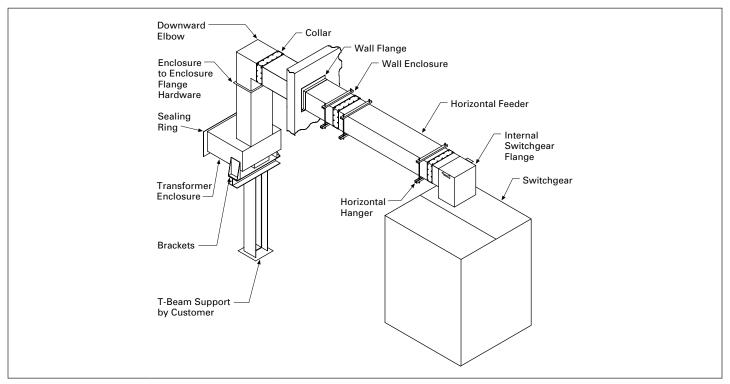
Typical Bus Run (Switchgear-to-Transformer)
